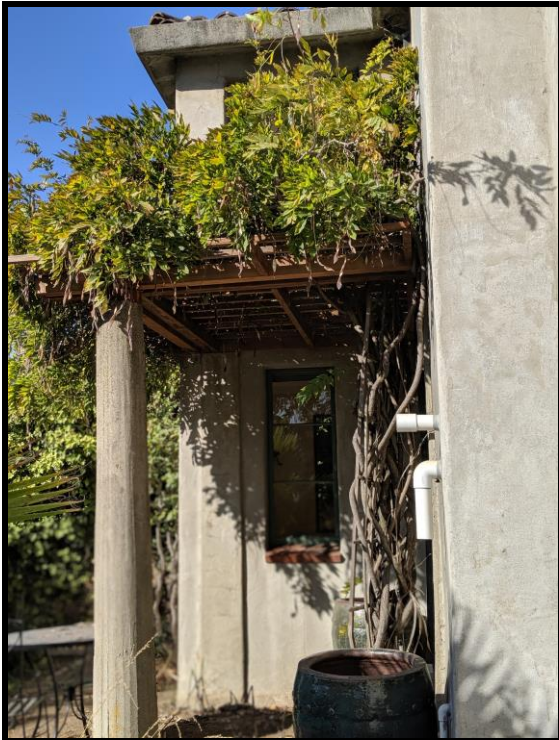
4 Mosswood Lane - wood trellis with fabricrete support column, facing north
